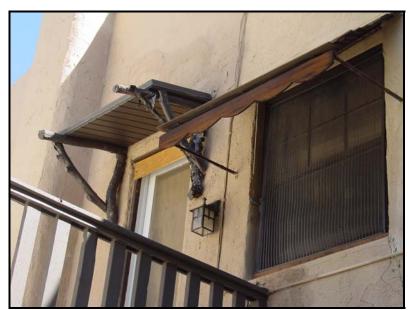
Detail of porch along south elevation of the Erickson Residence, looking east (2009).
